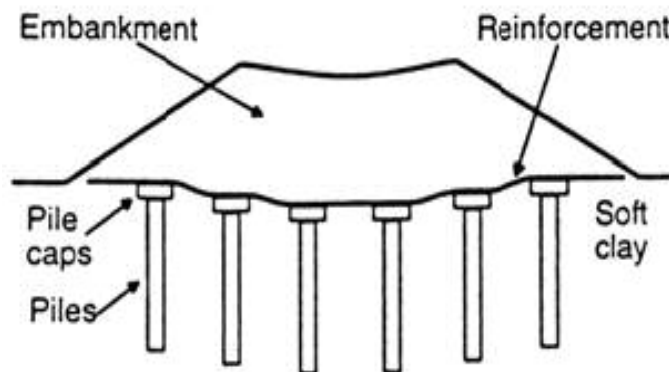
Serviceability Limit for Pile-Supported Embankment (Floss and Brau, 2003)
